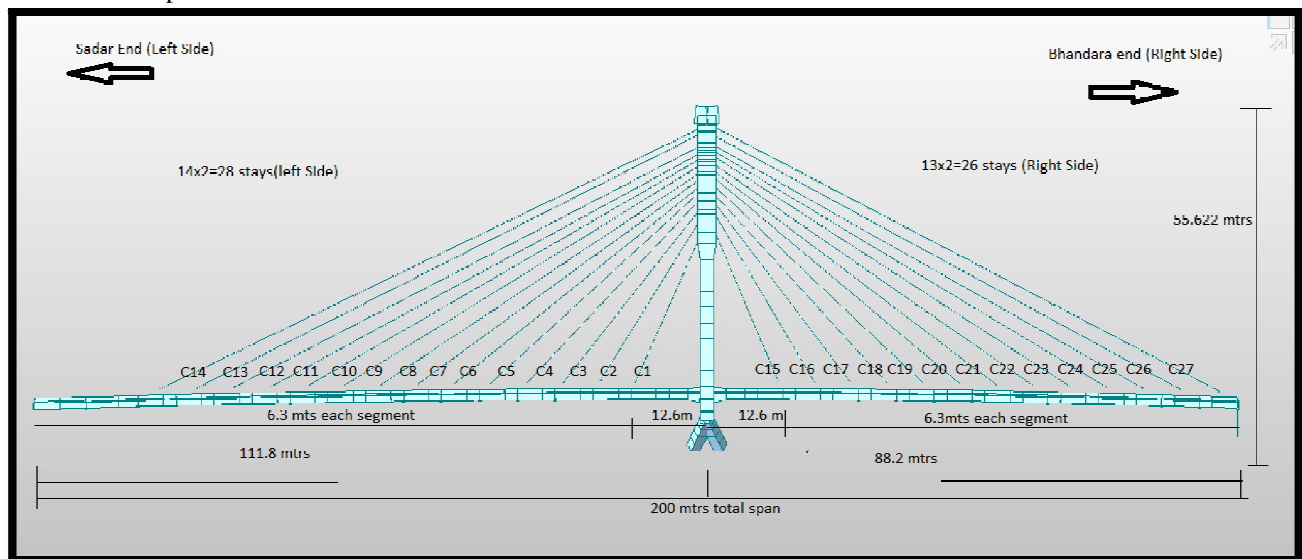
Model of Nagpur cable stayed bridge with elevation details.
